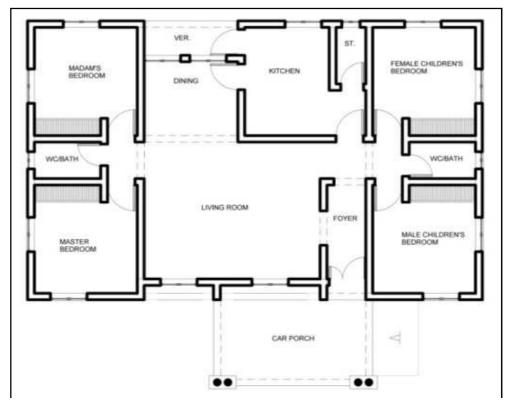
Floor Plan of Typical Post-colonial Igala Building. Source: Field Survey (2017).
